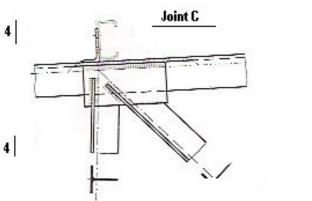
Examples of shop and field connections in a trapezoidal two-slope truss rafter
